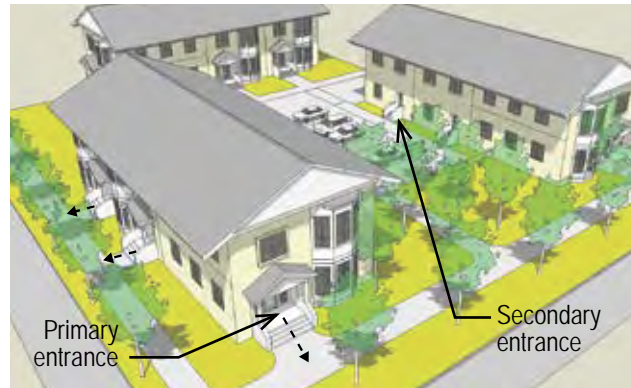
d.1.a.i. (1) Primary entries open directly to street right-of-way. Secondary entrances face parking lots.
